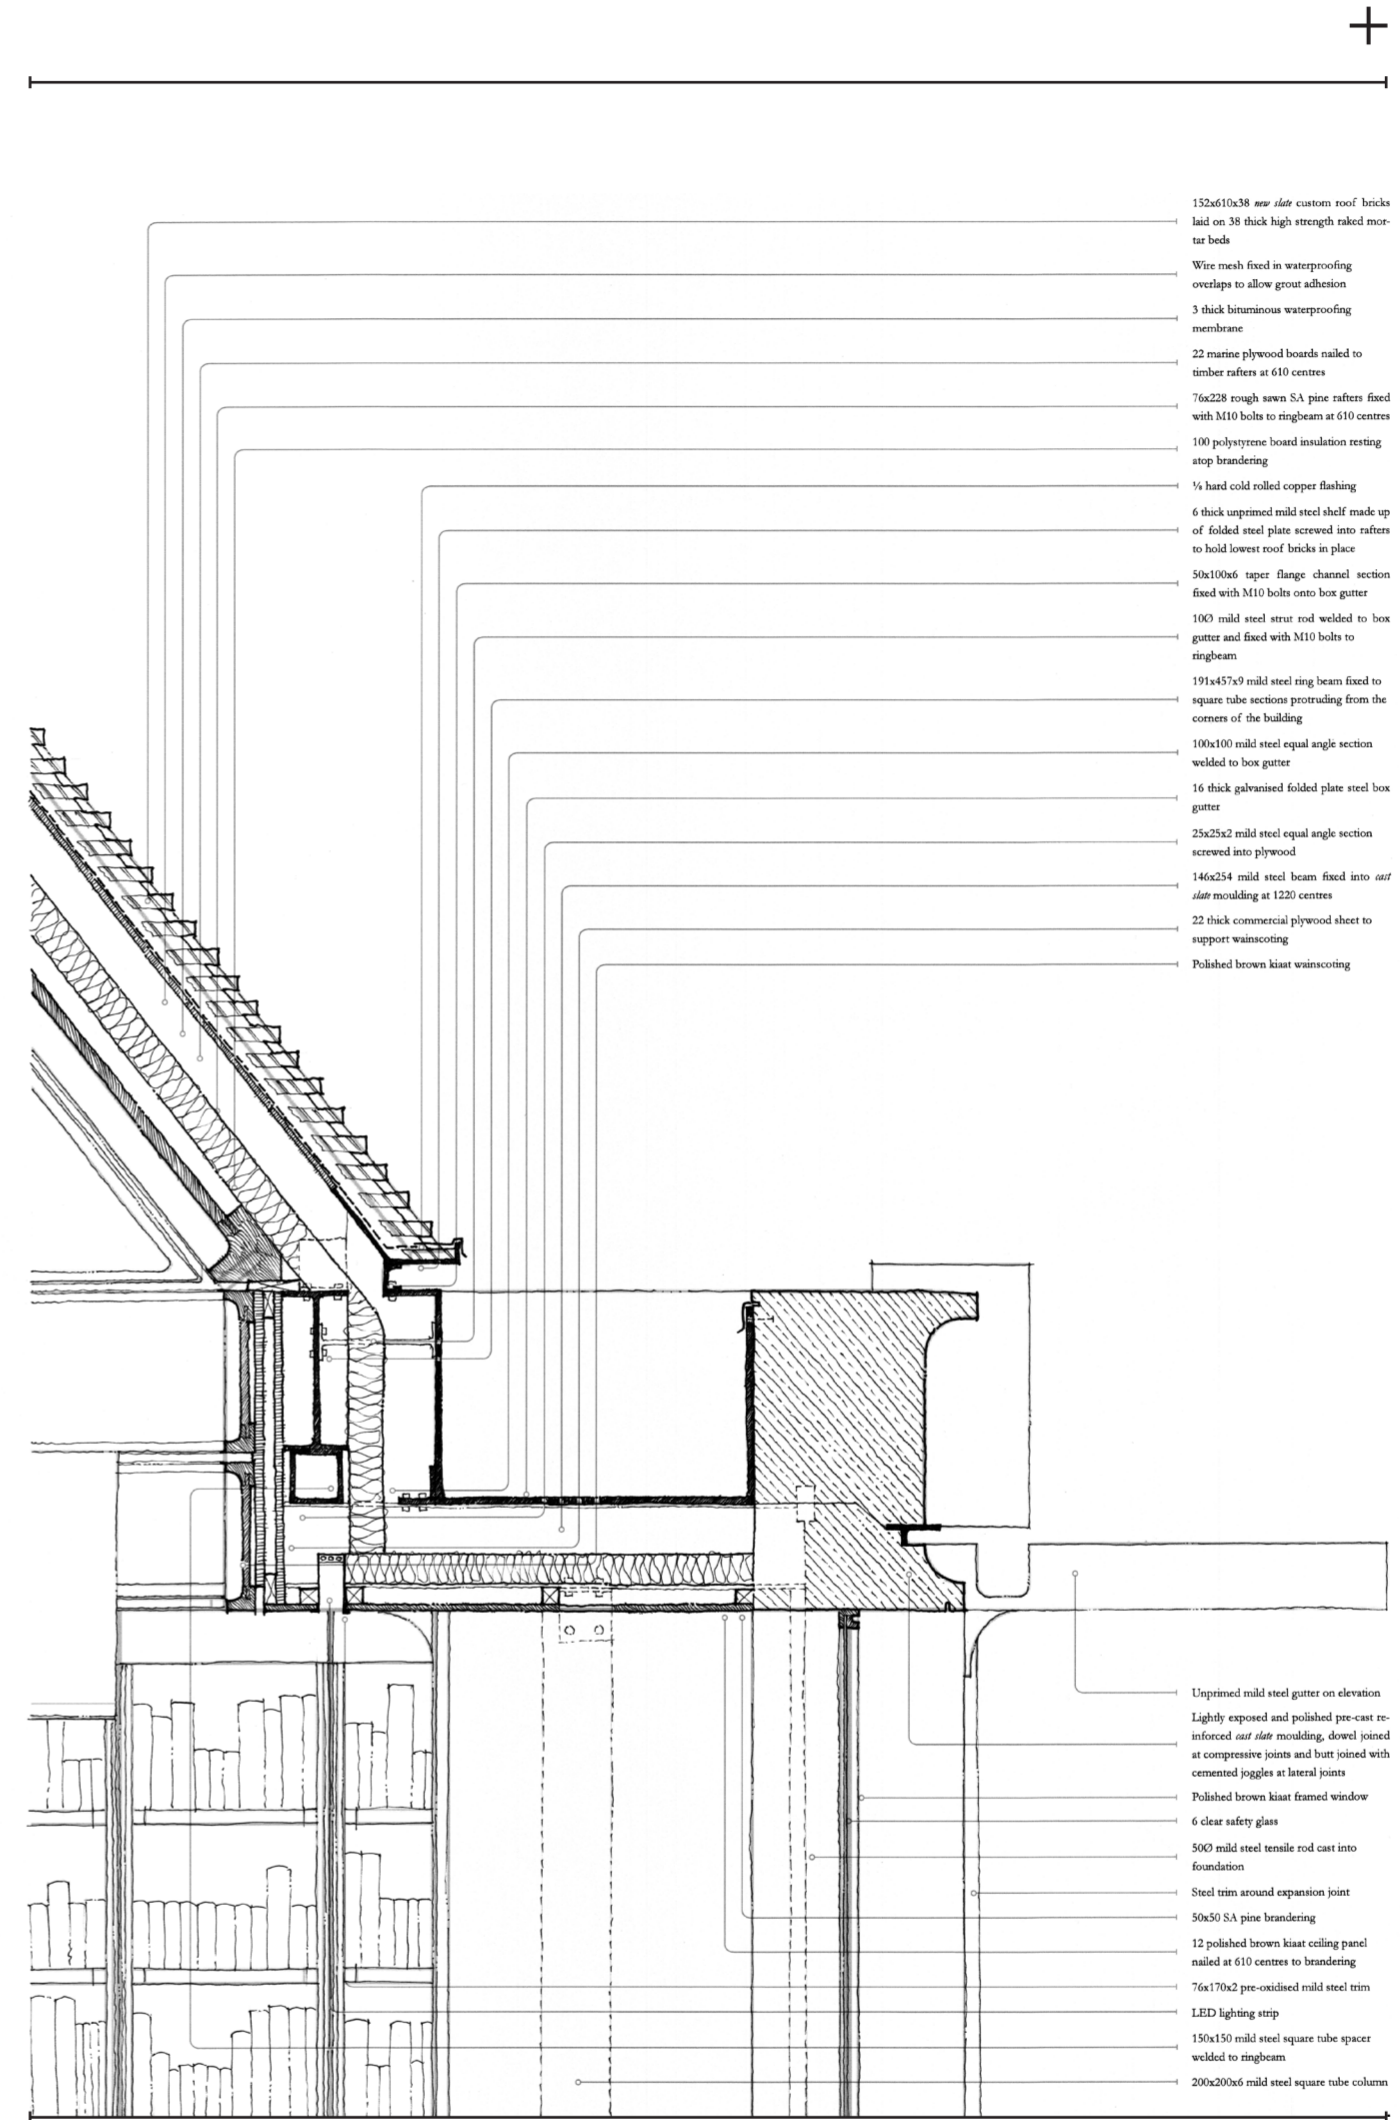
Wall to roof detail drawn at scale 1 : 10
